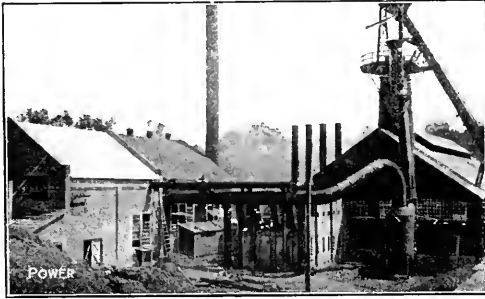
POWER HOUSE AND PIPING TO FURNACE
